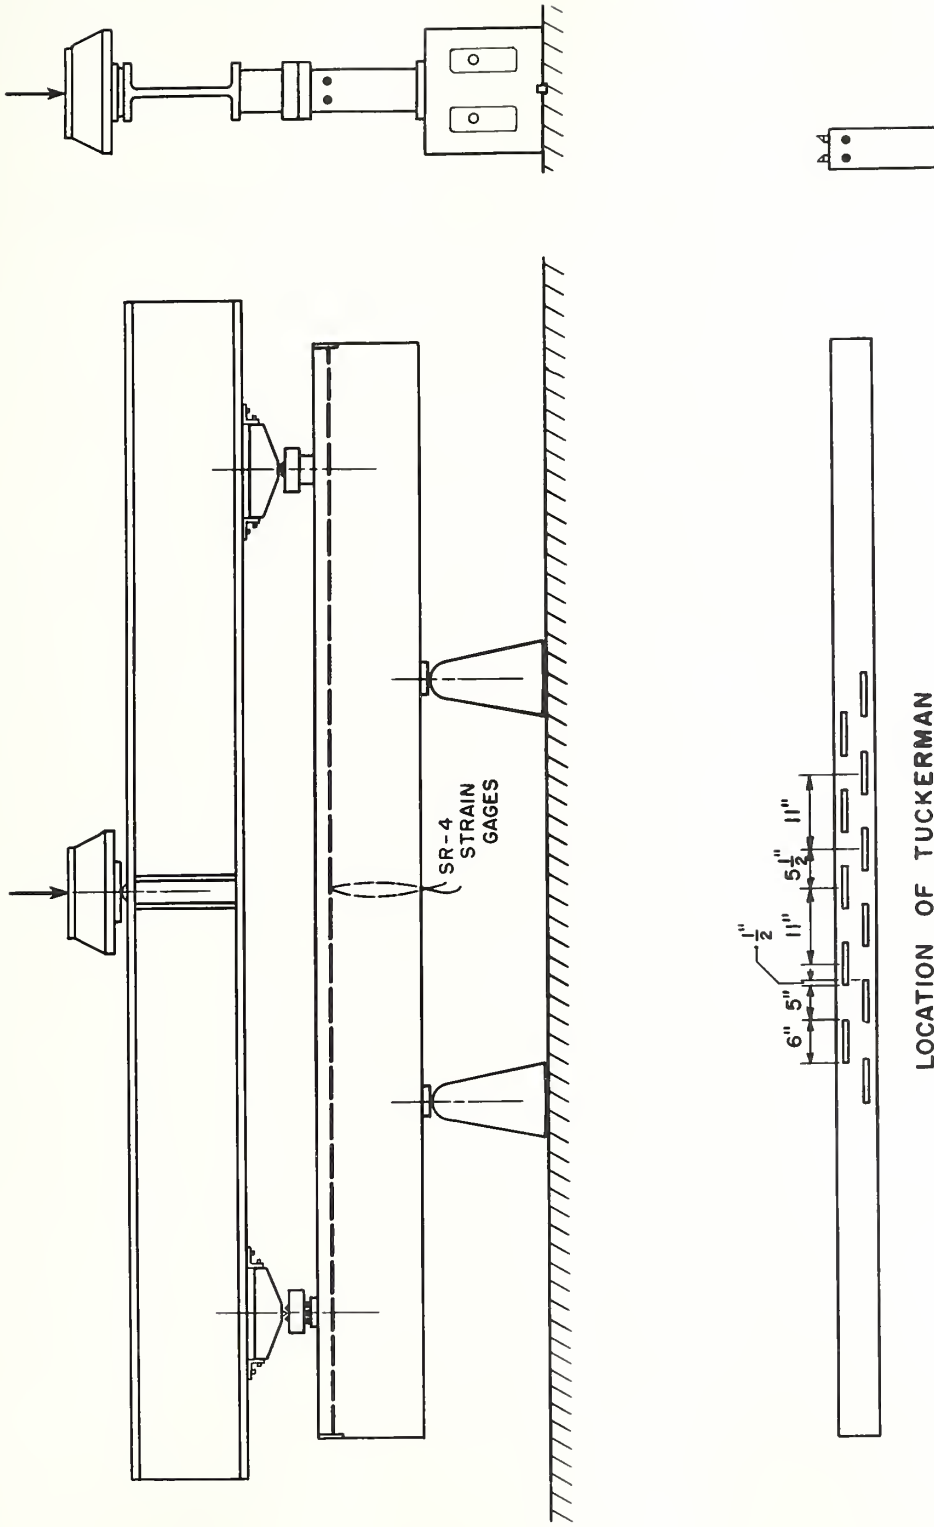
METHOD OF LOADING BEAM SPECIMEN AND ARRANGEMENT OF TUCKERMAN GAGES FOR MEASUREMENT OF WIDTH OF CRACKS .
